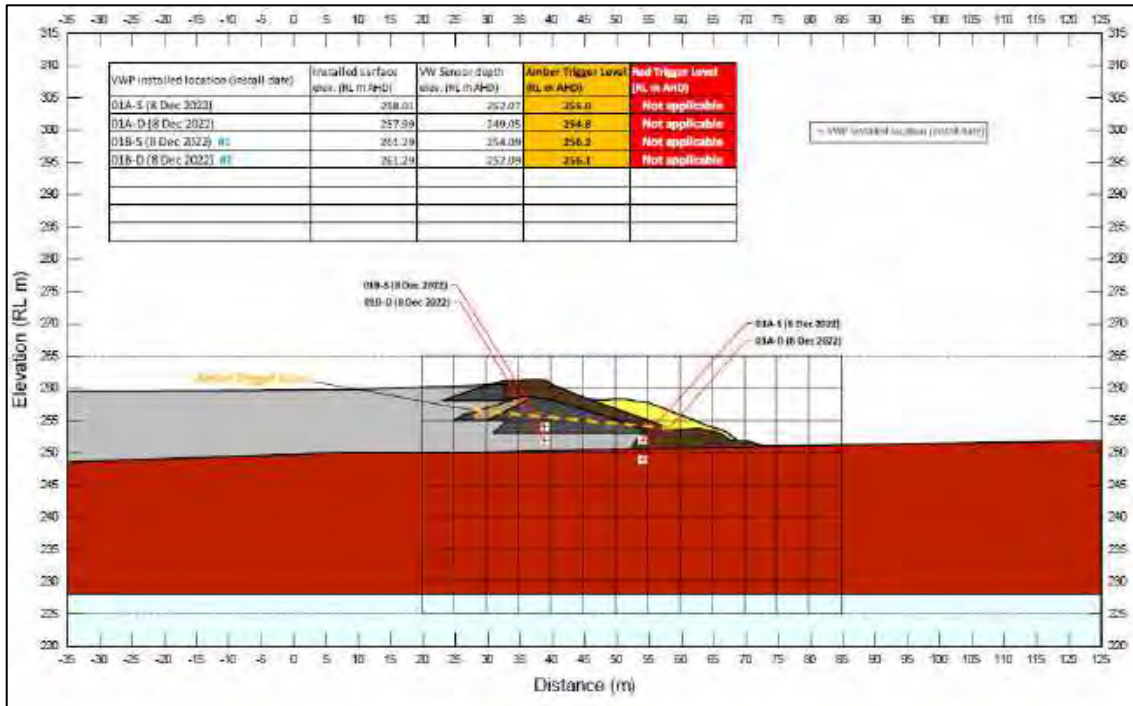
As-built FAD Cell a north wall embankment cross-section F - VWP trigger level profile
